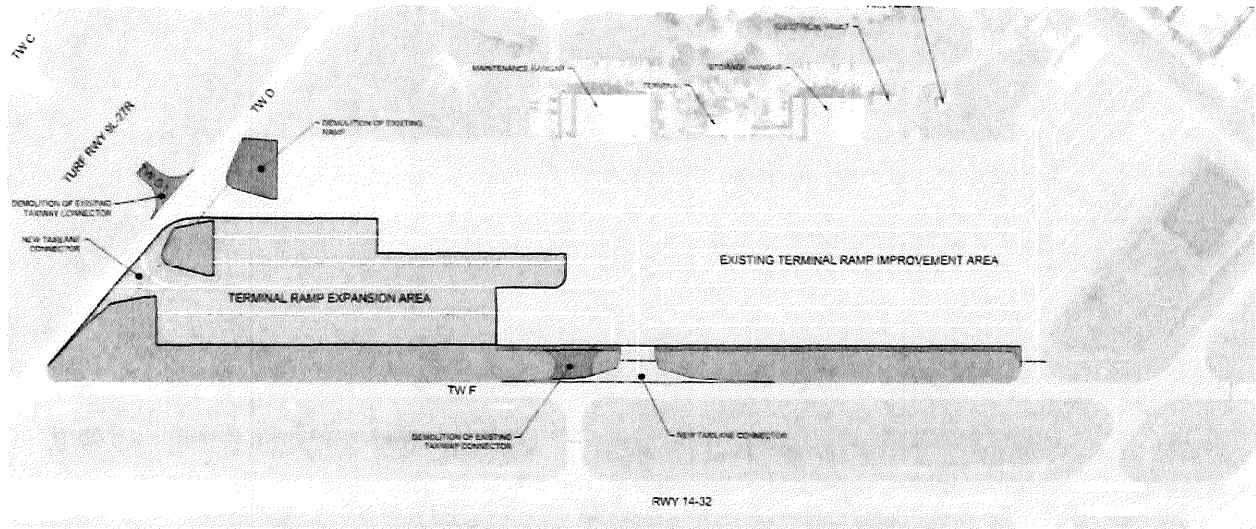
Alternative 3 Preferred Apron Expansion Layout
